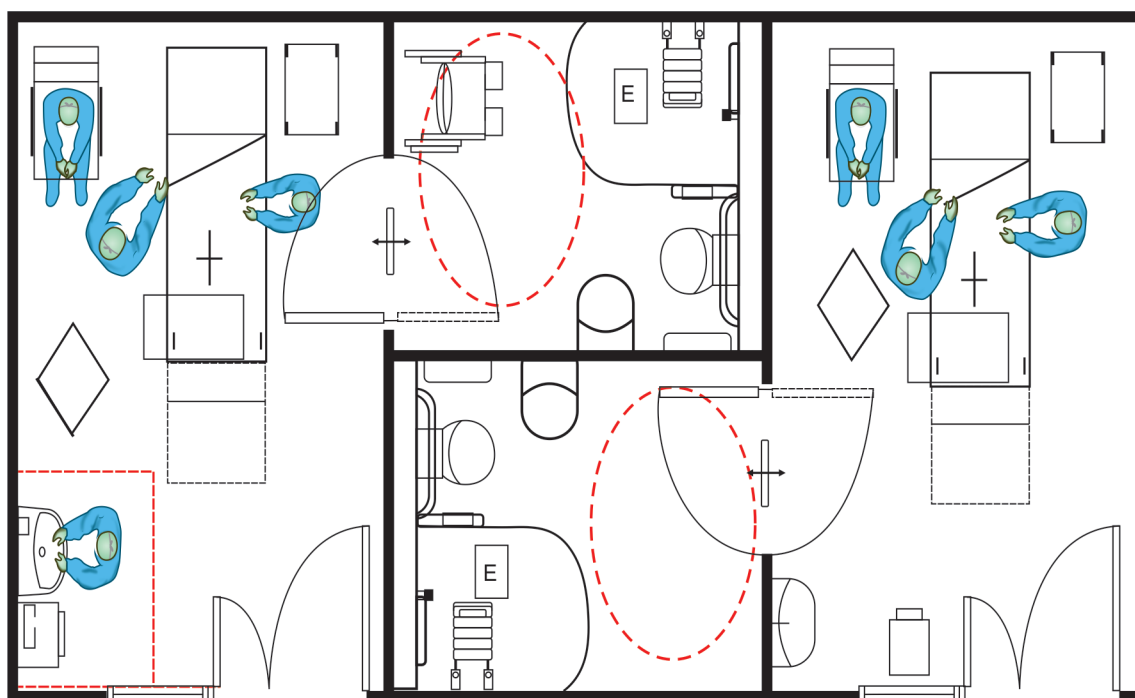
Upgrading existing rooms into isolation room with anteroom (adapted from NHS estates health building note)<sup>9</sup> instead of existing bedrooms
